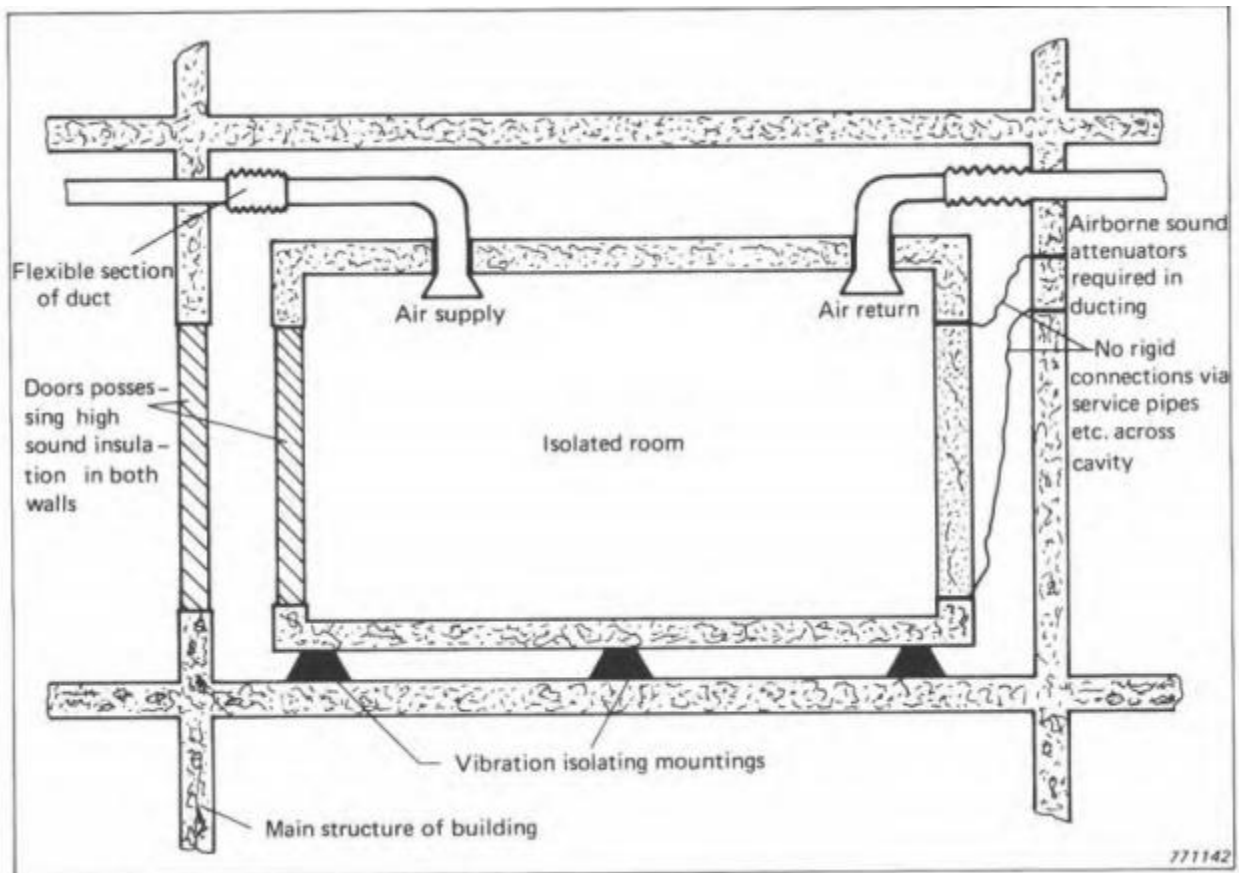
Box within a box discontinuous construction: vertical section through an isolated room
